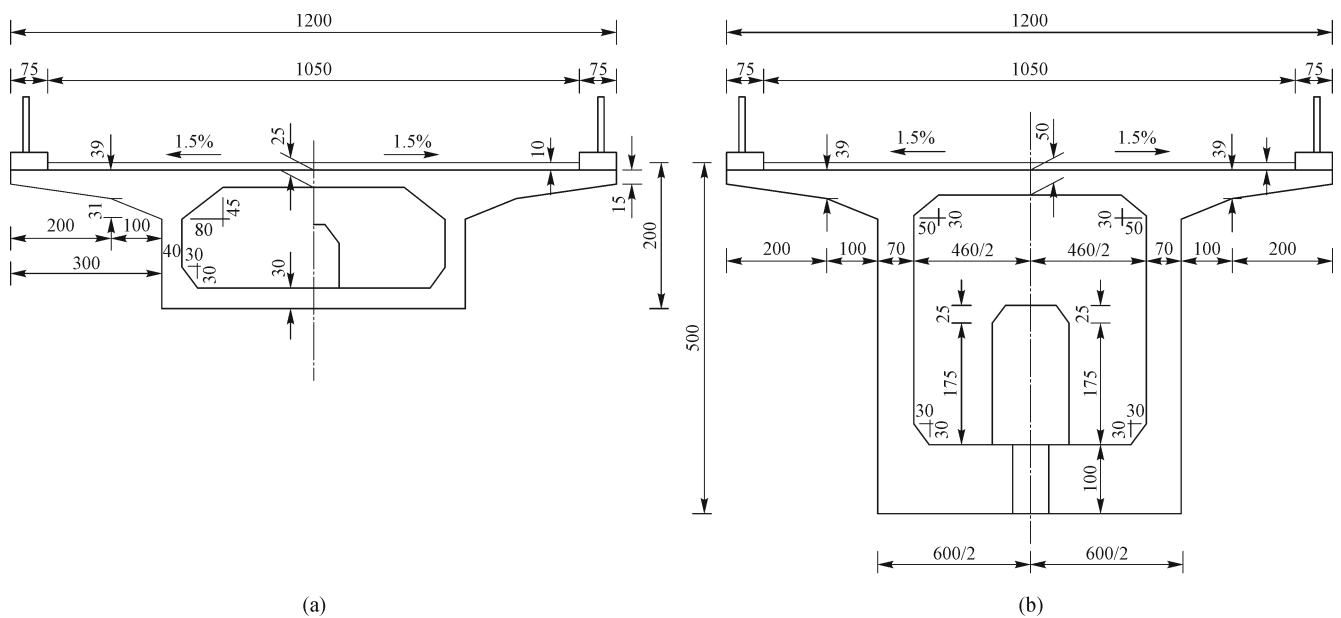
Transverse section. (a) The span box girder; (b) the pier box girder/mm
